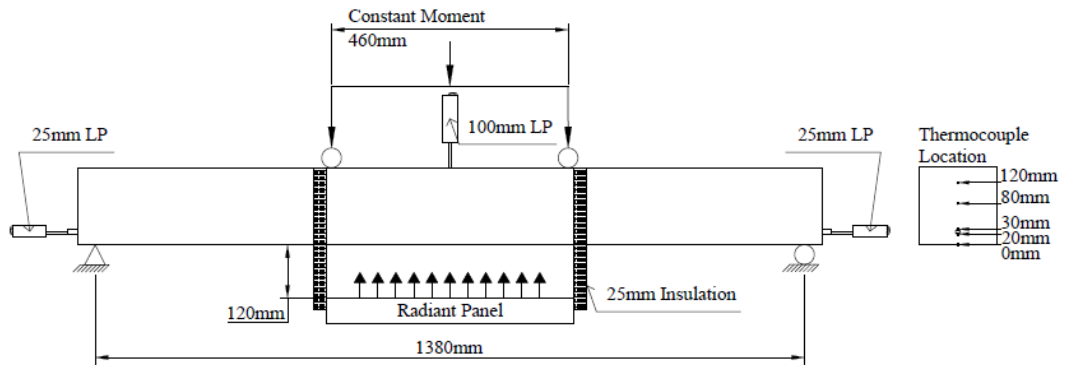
Schematic showing Test Setup for Steel/ FRP Reinforced Concrete Beams under Transient Heating
